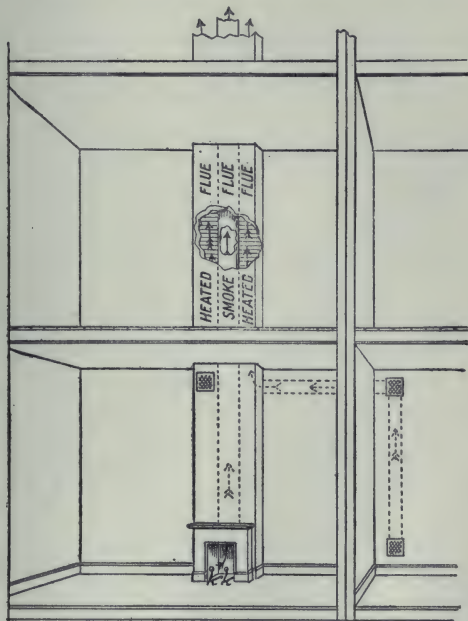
Outlet ducts for ventilating adjoining rooms.
